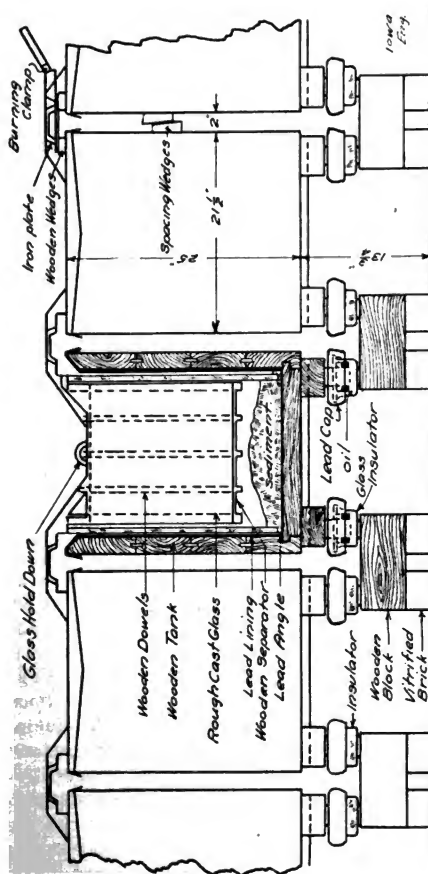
Type of Construction used on New Battery Installation, United Railways Co.
